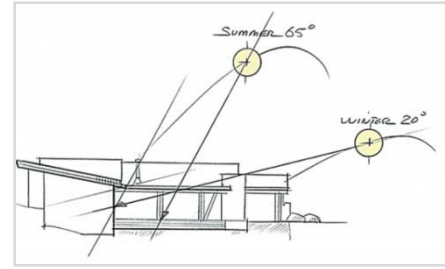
In winter, the sun's trajectory is lower in the sky, so more light penetrates the west-facing windows of the house and warms the concrete floors and the east wall.
